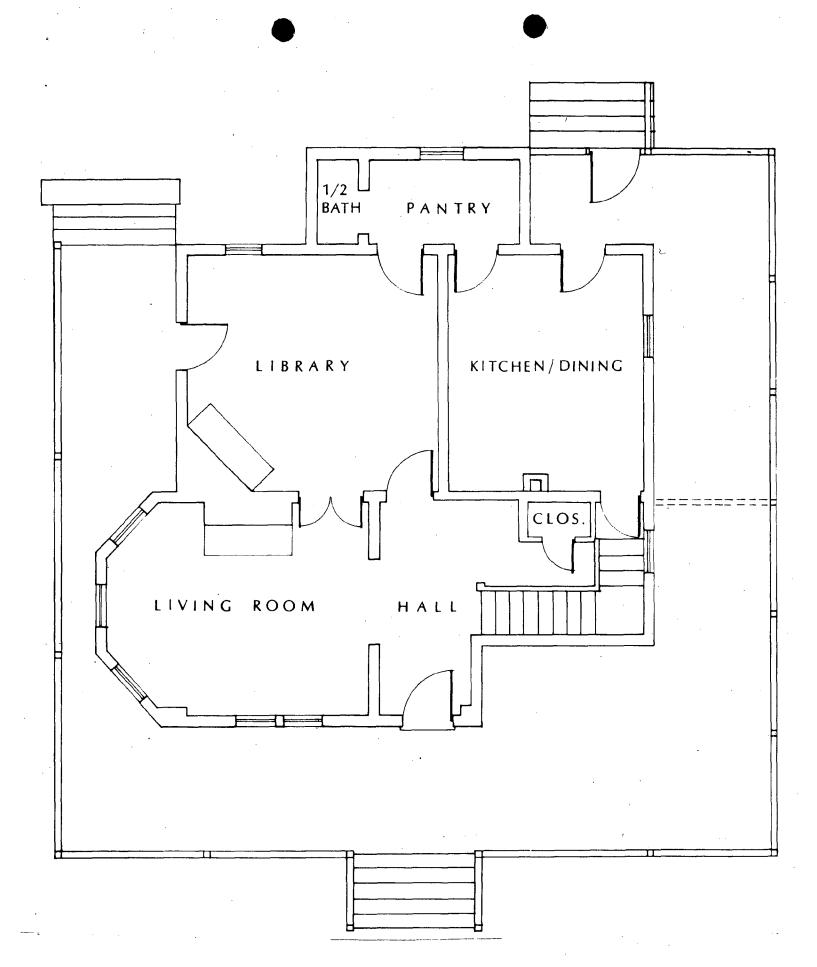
Plan of first floor and exterior wrap-around porch and stairs
